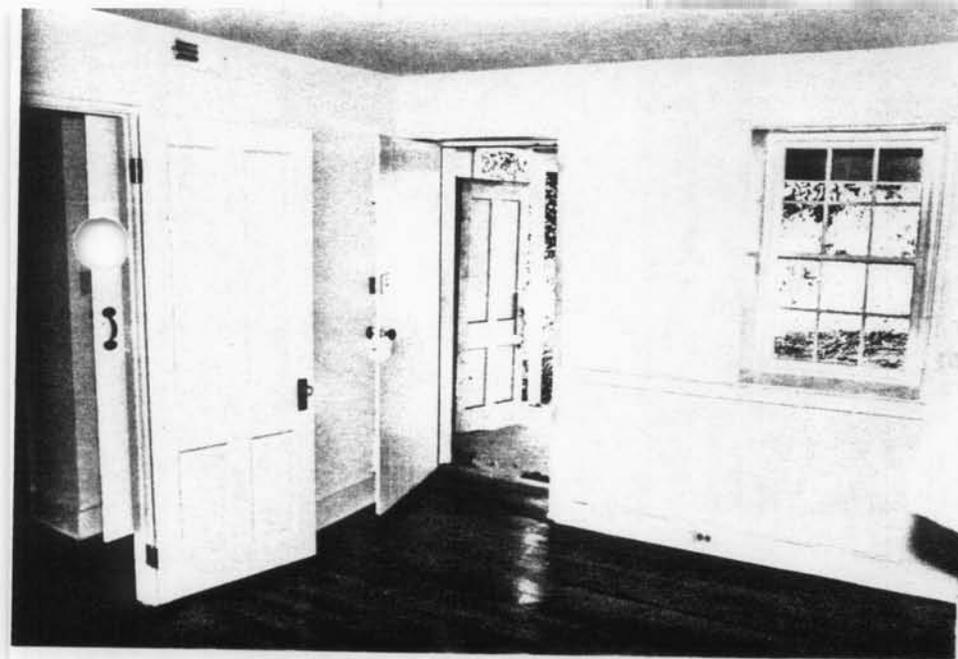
Second floor of stone hse. Later partitions removed; fireplace, floors, trim and wainscoting repaired and restored. Door onto back is original and was retained along with all historic interior doors. Stairs to attic reoriented to stair hall by turning bottom several steps 90 degrees.
